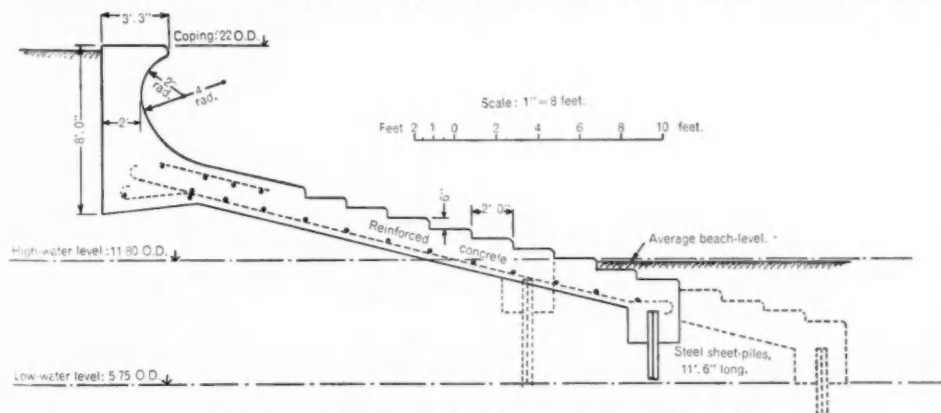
Cross-Section of Sea-Wall at West Bay, Portrush.
